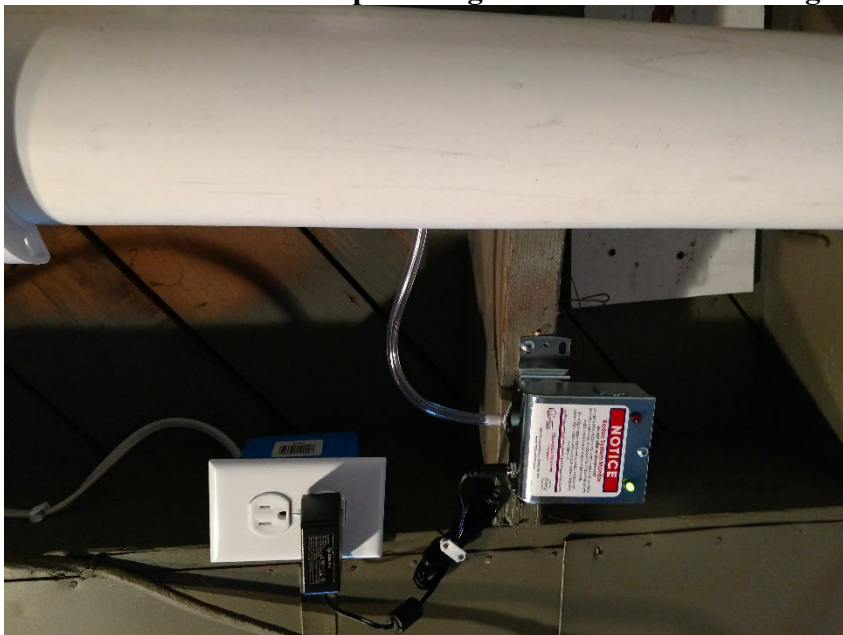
An audible vacuum alarm was installed on the main horizontal run.
